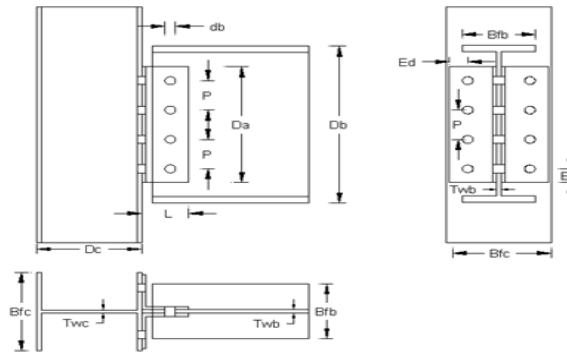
DETAILS OF DOUBLE WEB ANGLE CONNECTION
